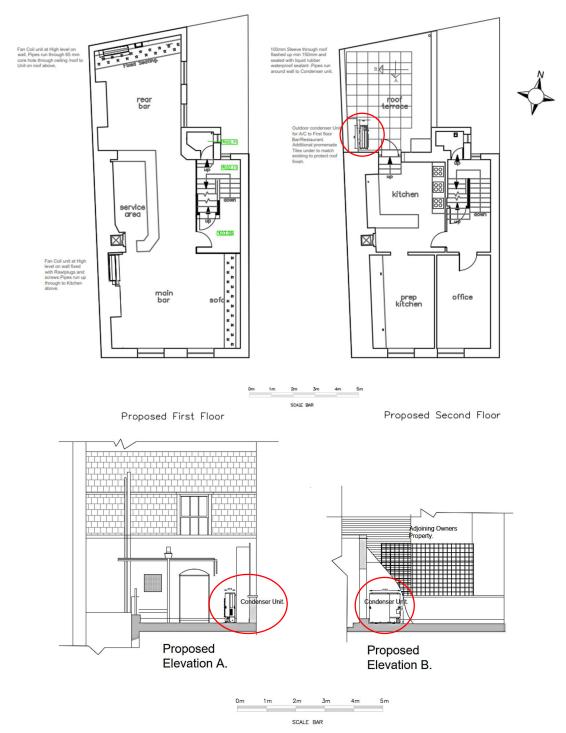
Site plan and roof elevations showing proposed location of external plant circled red
